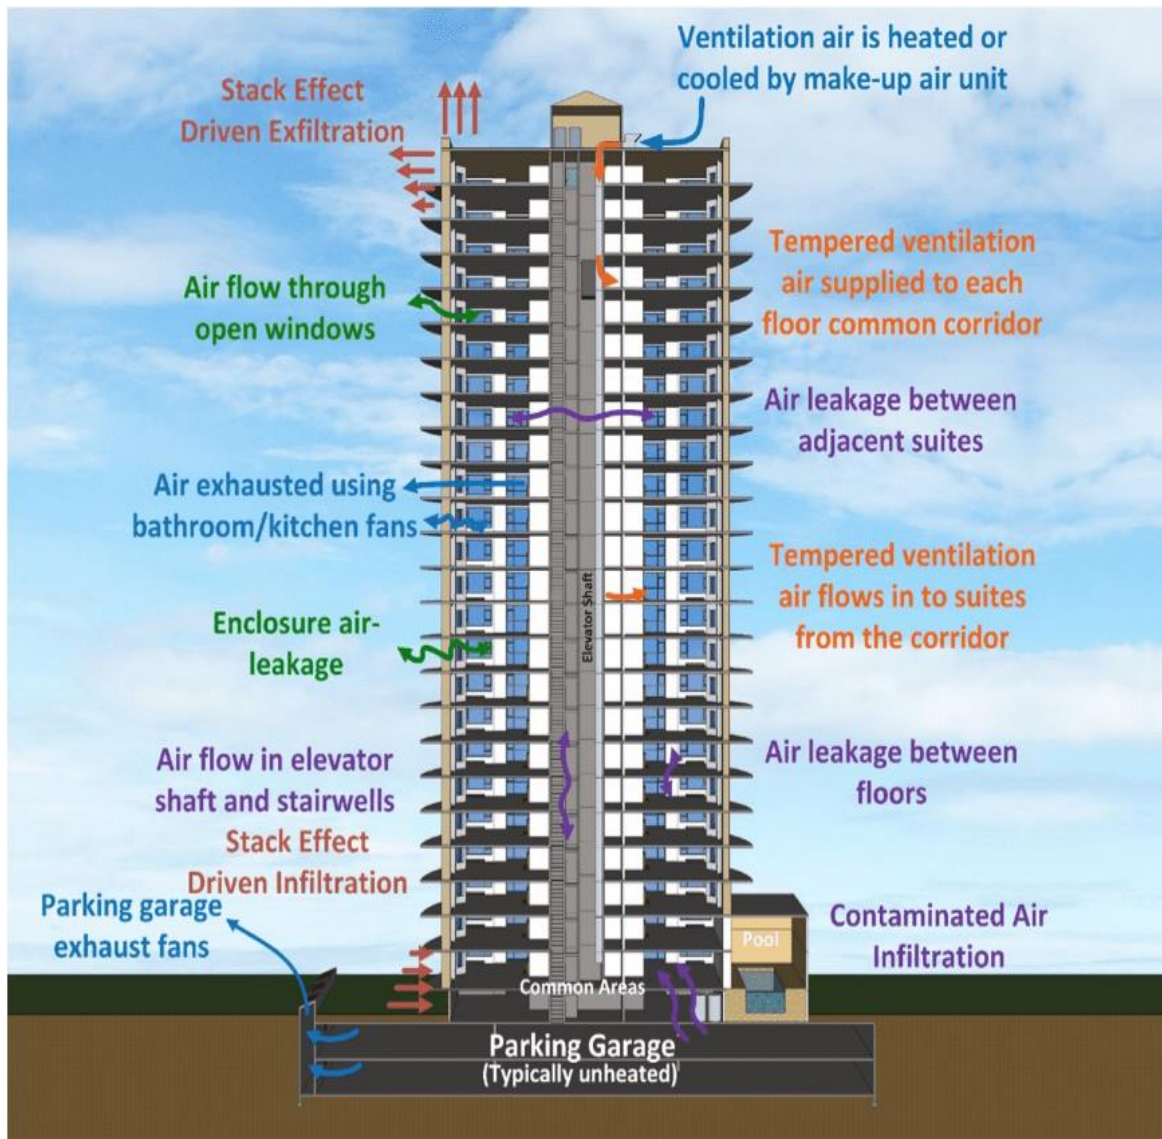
High-rise Building Section Showing Stack Ventilation
